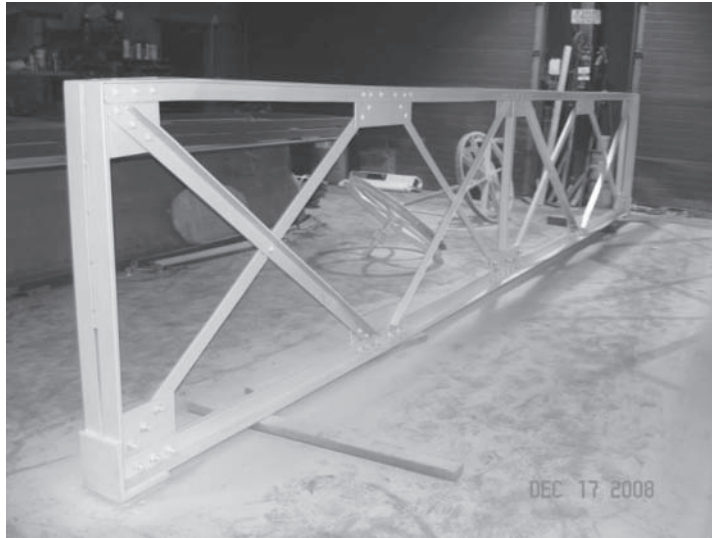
View of rehabilitated truss after prime coat was applied in the shop. Note shafts and gearing in the background.
